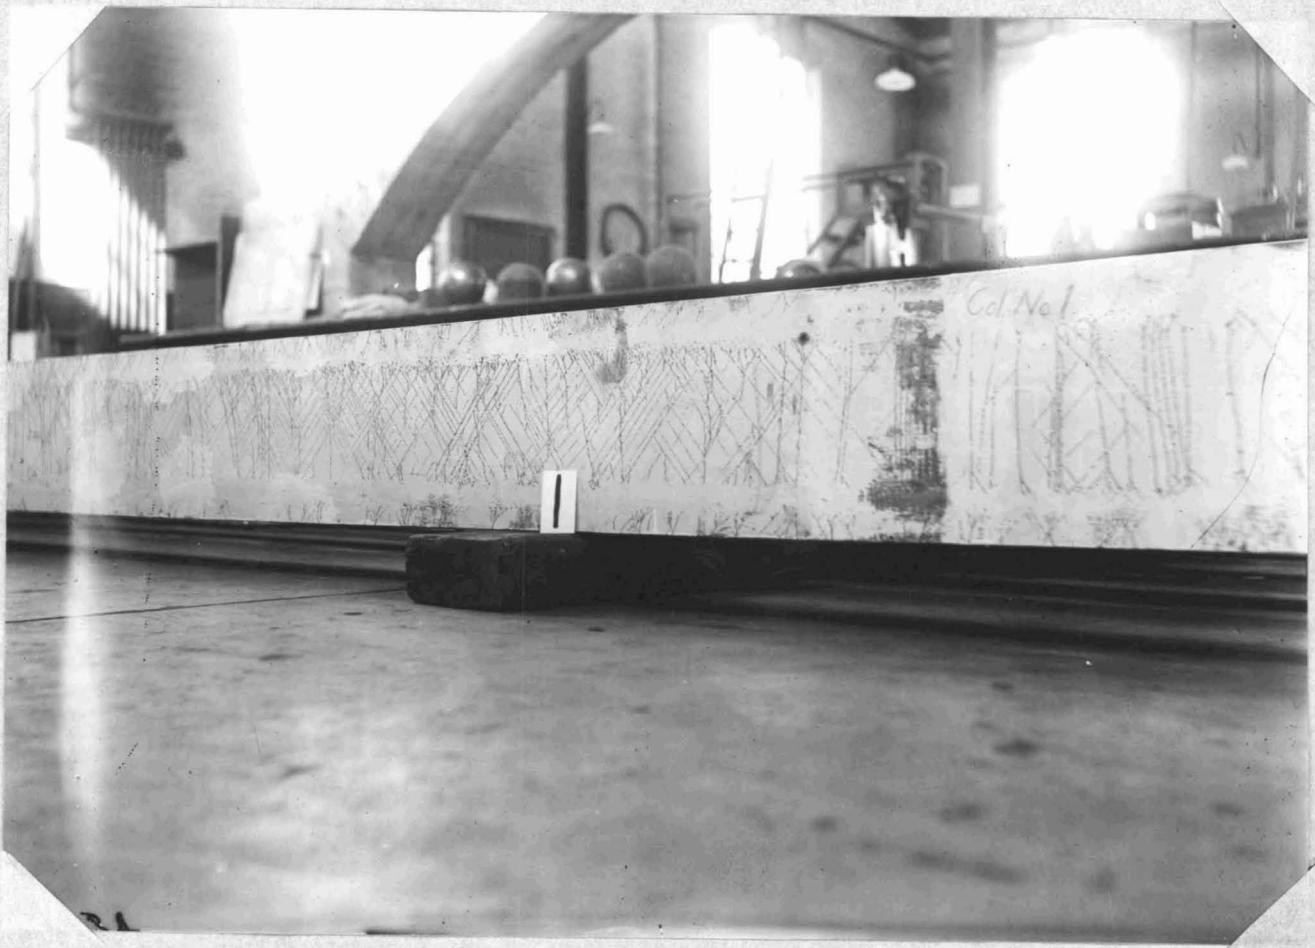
Strain Lines on Exterior Face of Column 1 at Maximum Load
